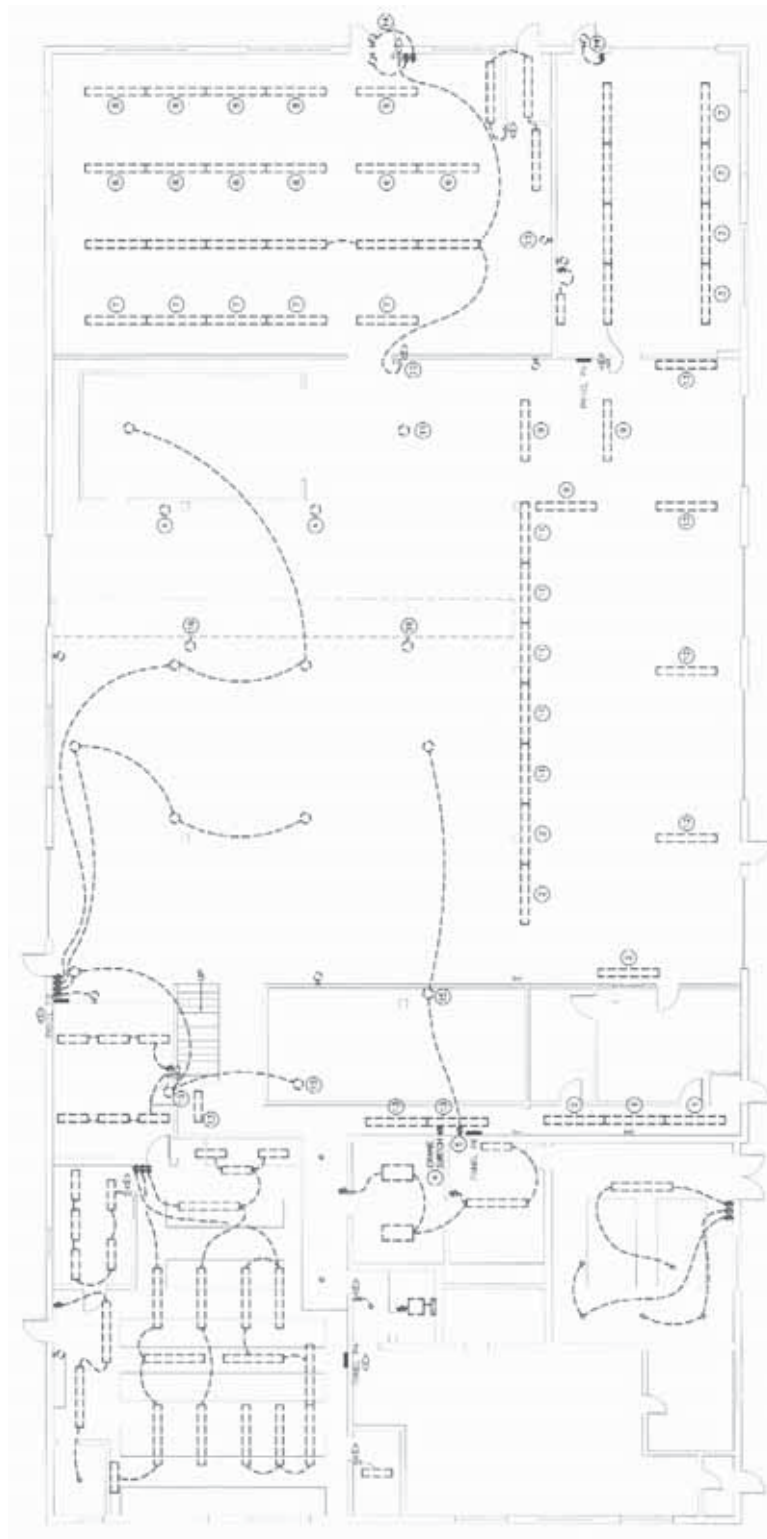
Building Floor Plan from Electrical Demolition Plans dated March, 2006, Sheet E-1, provided by VTrans (N.T.S.).
